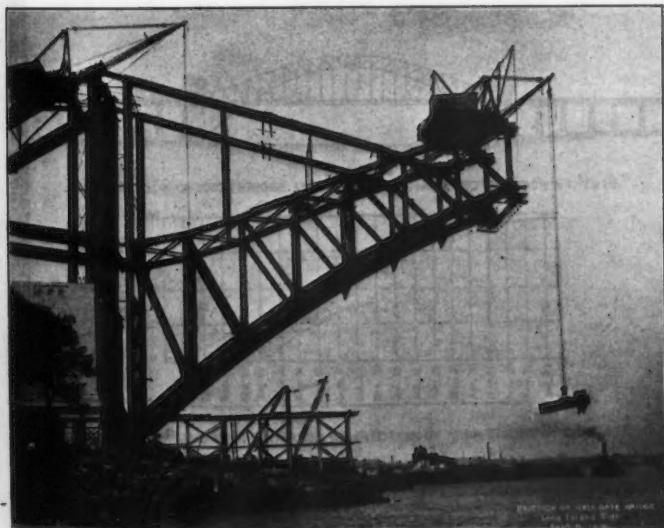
HELL GATE BRIDGE: ERECTION STAGE, SEPTEMBER 2D, 1915,
